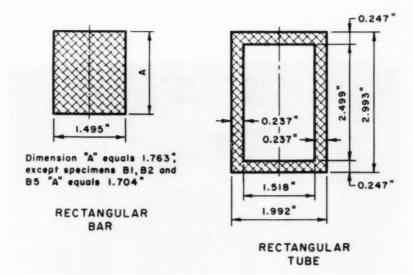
AVERAGE CROSS SECTION DIMENSIONS OF COLUMN SPECIMENS
